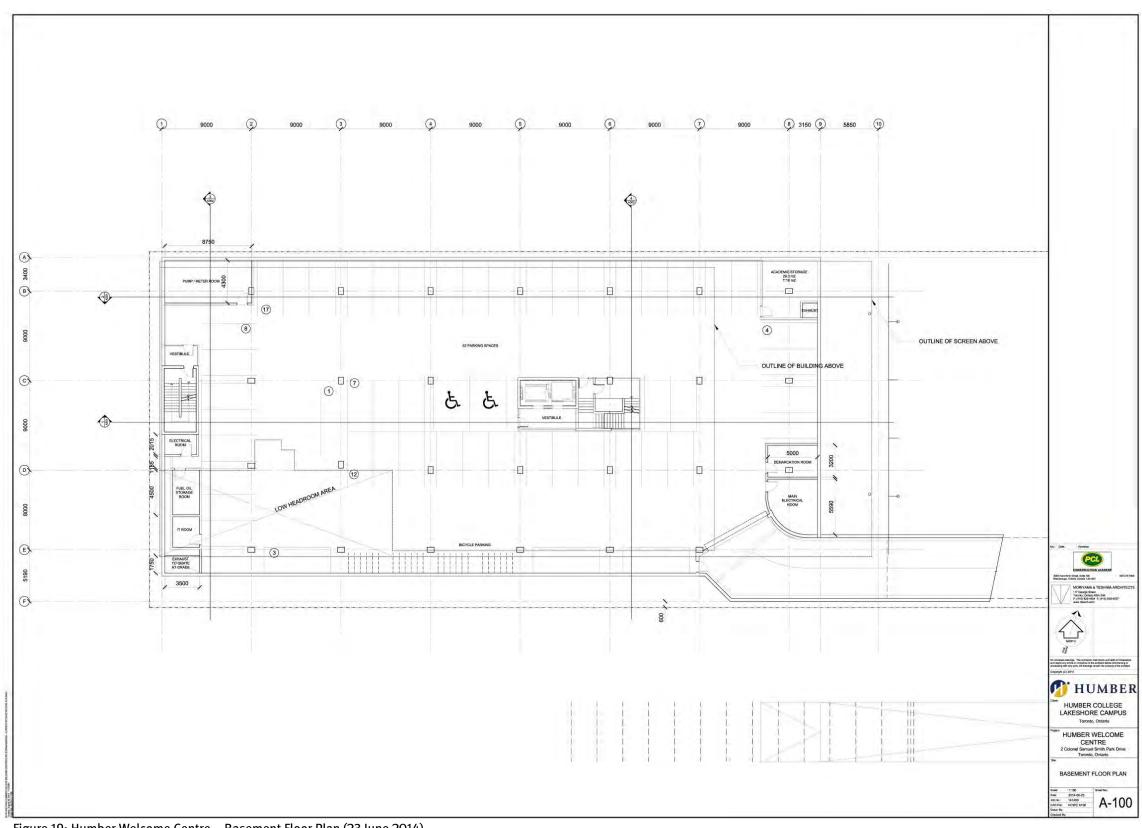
Humber Welcome Centre – Basement Floor Plan (23 June 2014)
